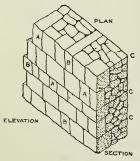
Rubble Wall Faced with Coursed Rubble.
